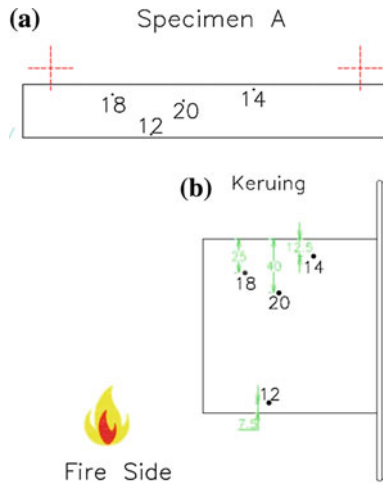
Position of thermocouple on the beams, a top view and b side view
